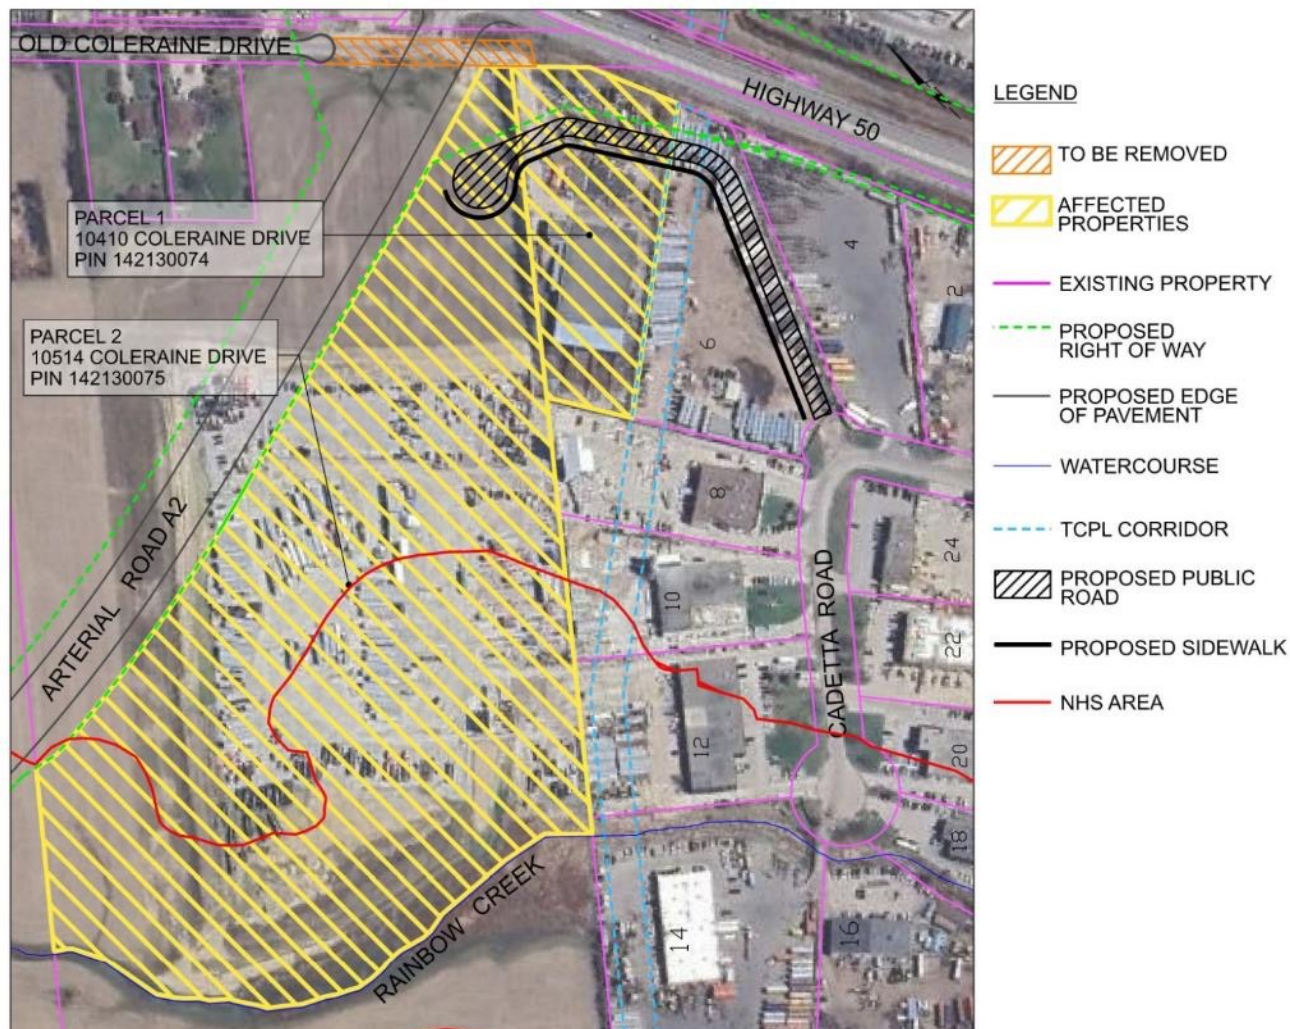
Options 6A & 6B Extension of Road Access at ‘Elbow’ of Cadetta Road
